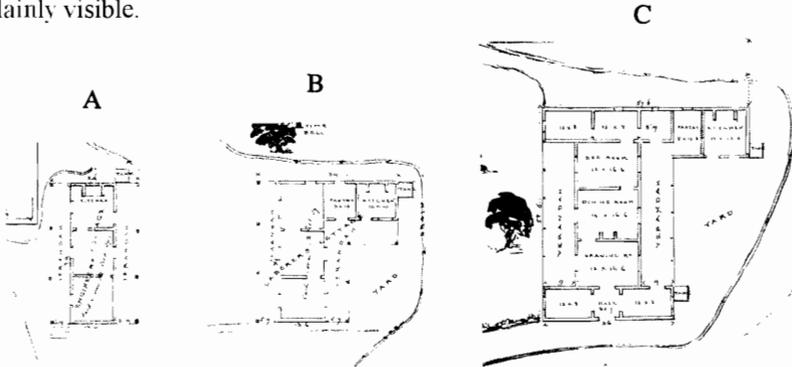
A: Plan of engineer's house. B: Plan of labourer's house. C: Plan of manager's house. Natal Coffee Works Umgeni Village (Architectural Library, University of Natal, Durban)
